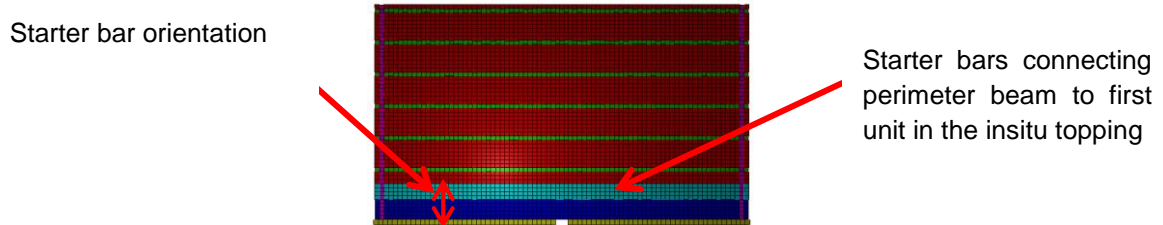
Starter bar typical model layout (arrangement 3 shown)
